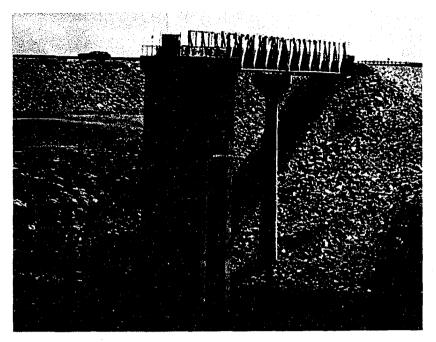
Multi-level intake tower of the river outlet works. (Photograph courtesy of the Bureau of Reclamation.)
